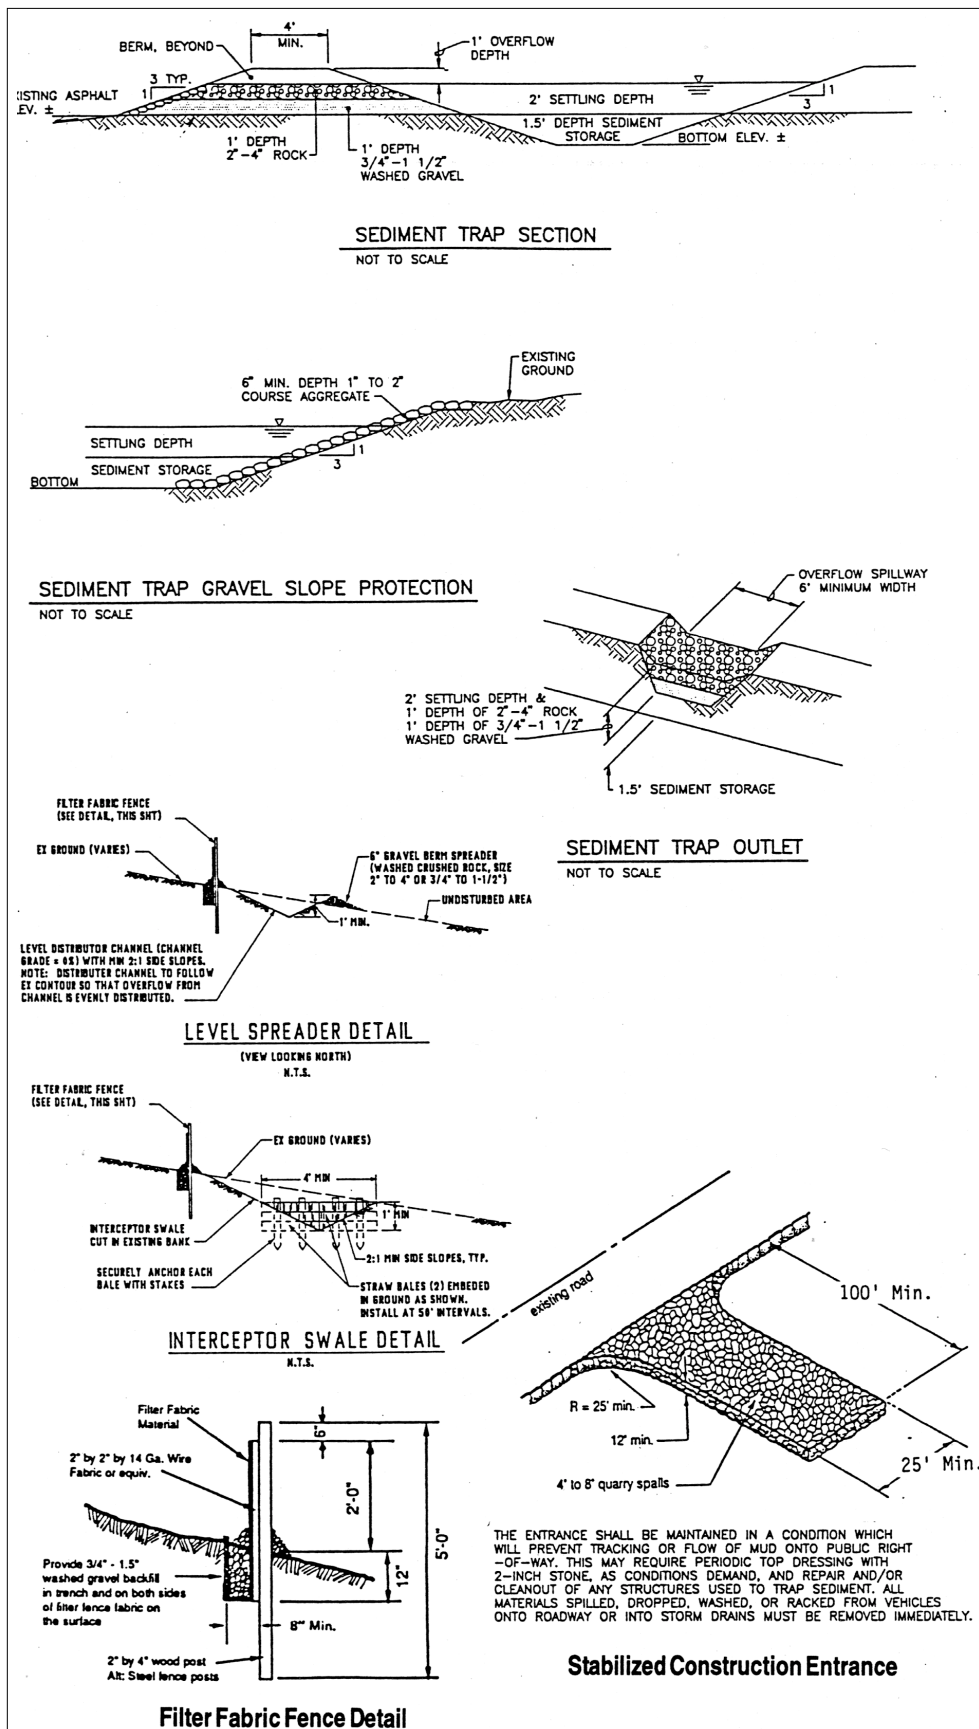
b. Narrative Plan Notes: Large Project Construction Stormwater Control BMP
